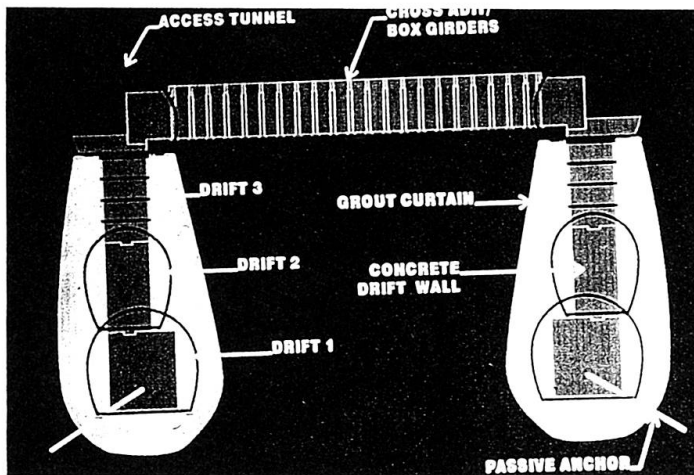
Cross-Section of Underpinning Systems with Drift Walls, Grout Curtain and Post-tension Box Girder Roof.
